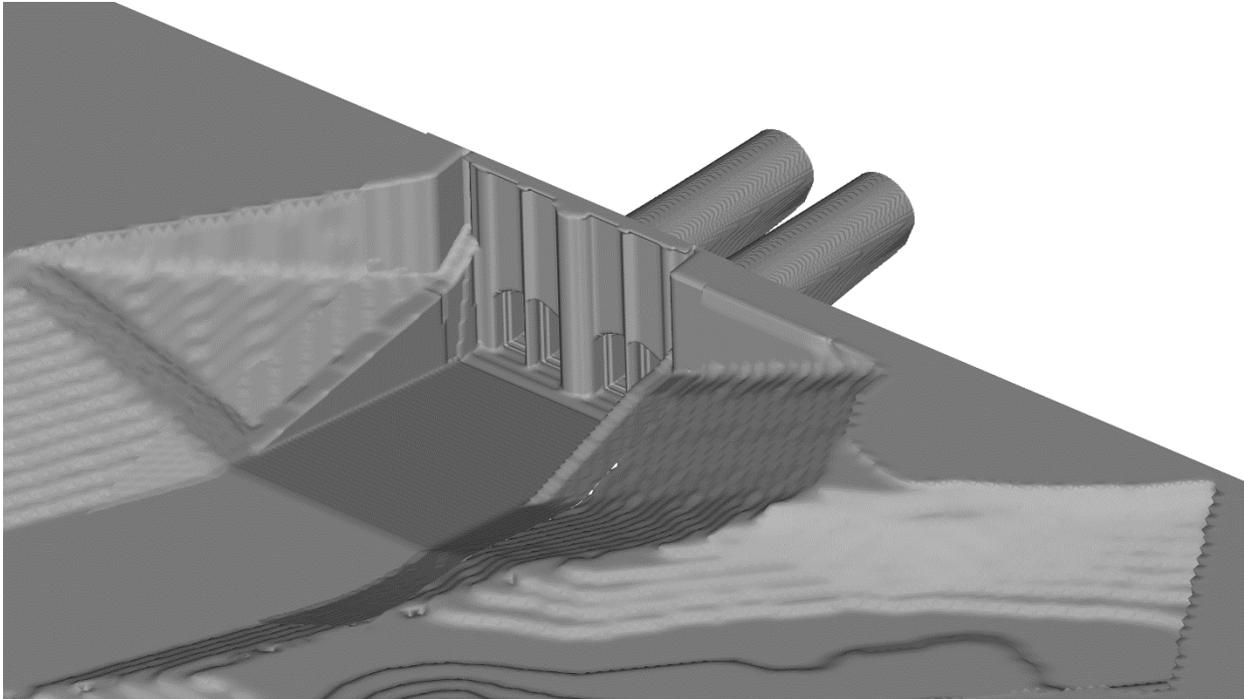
Proposed I/O Structure Geometry and Lake Jocassee Bathymetry – detailed rendering of structure
